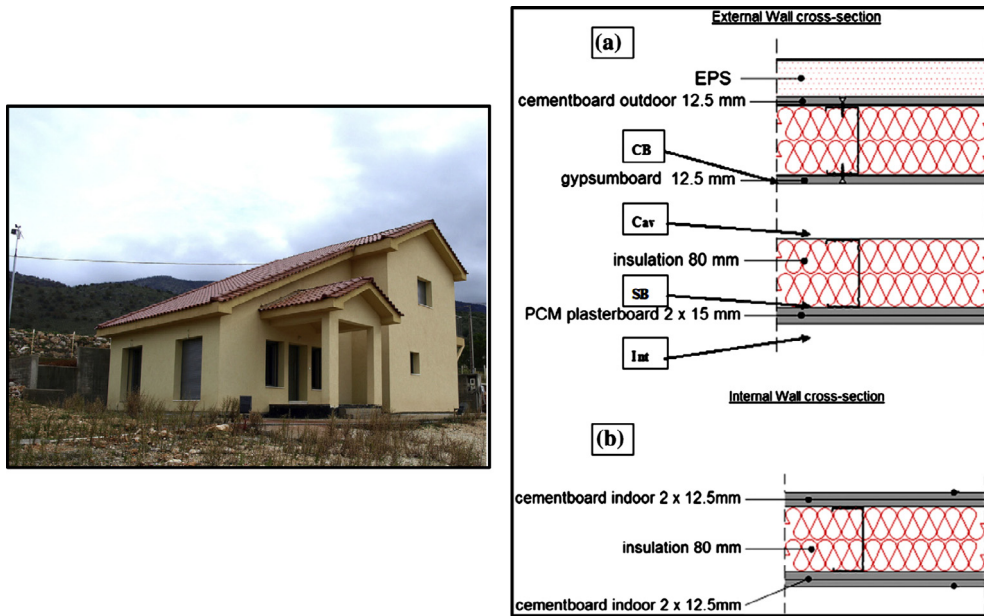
External cross-section view of the house: (a) the external wall, where “CB”, “Cav”, “SB”, “Int” correspond to temperature sensors position in the LVR east wall and (b) the partition wall with cement boards [122].
